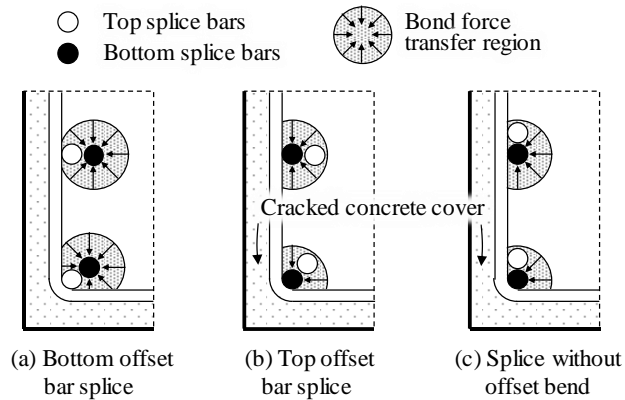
Effective concrete area for bond transfer after concrete cover spalling
